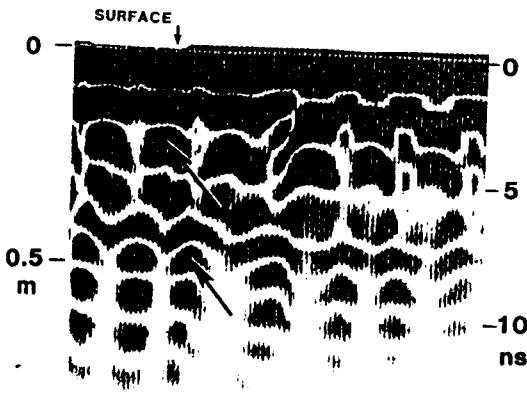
GPR profile over surface of a concrete floor slab. Width of scan is 2 m. 500 MHz antenna, 35 ns range. Arrows indicate two layers of rebar.
